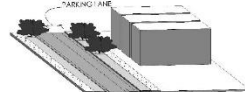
Waiver Diagram. A Yield Street allows for a reduced travel lane and provides on-street parking to calm traffic.
